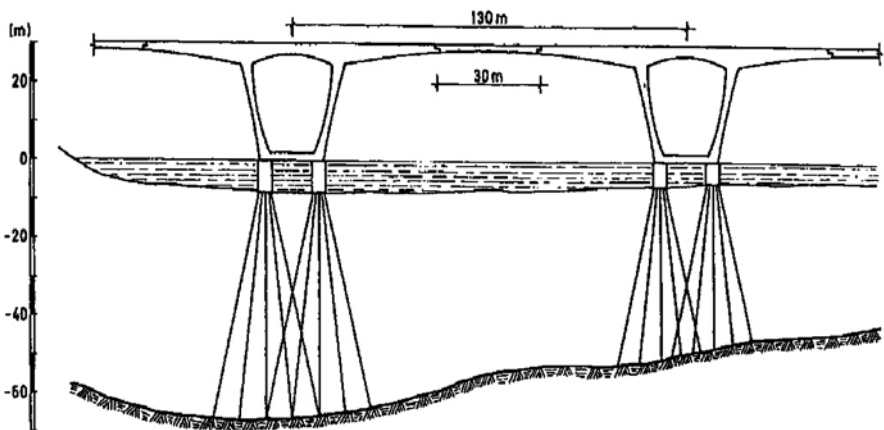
Schematic elevation of the International Guadiana bridge
